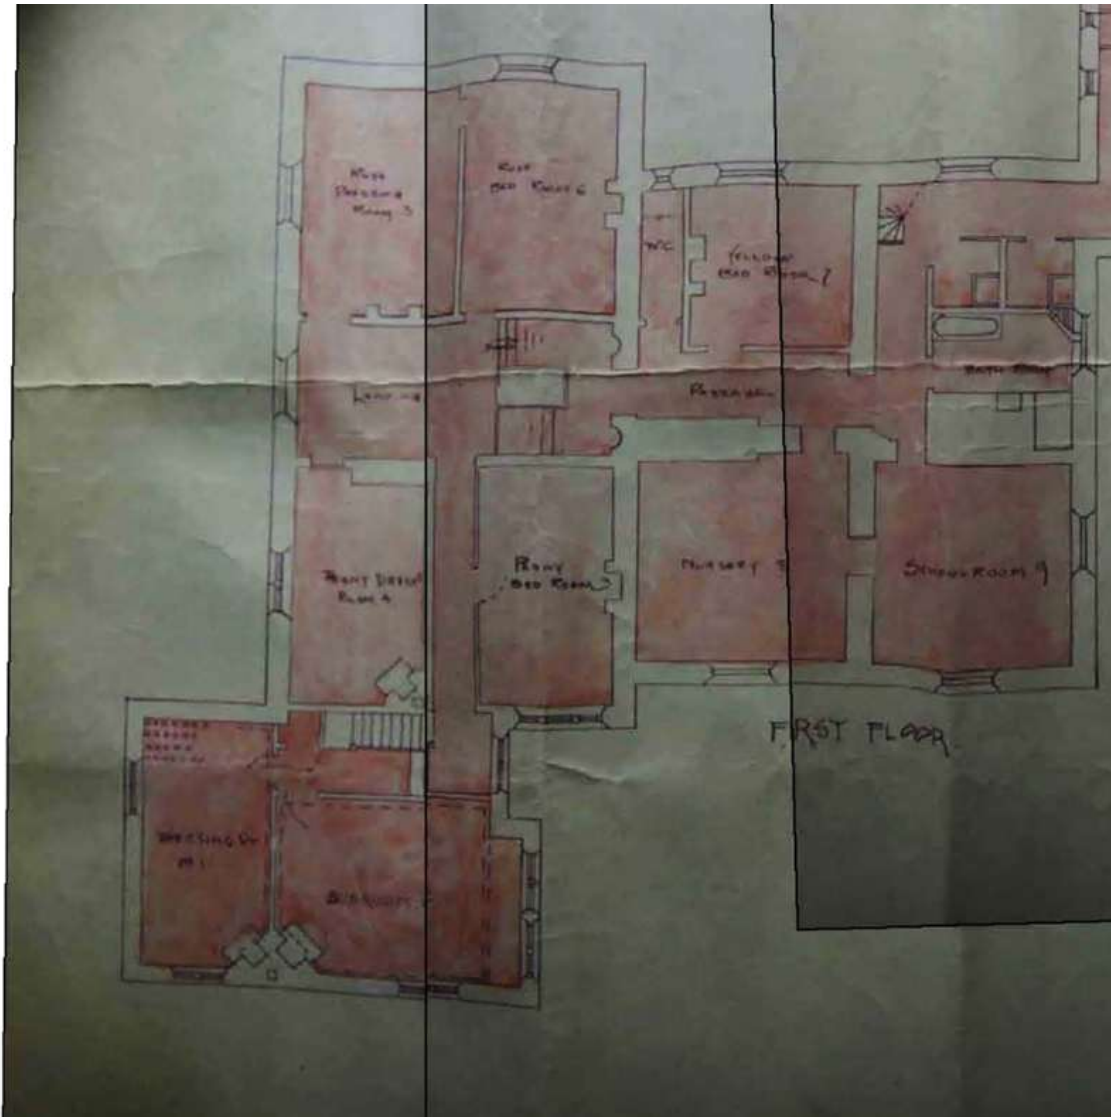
First floor plan of 1911 (Micklethwait family archive, not to scale)
